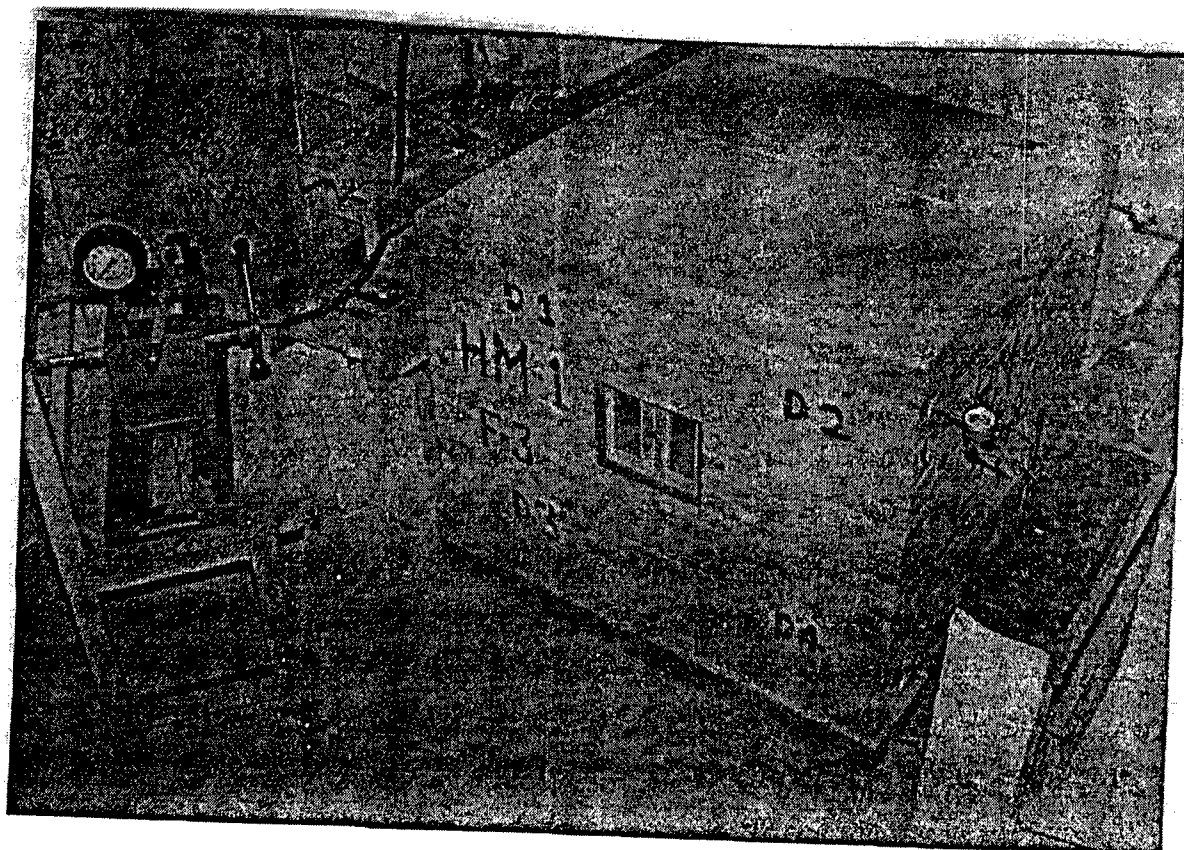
Test Setup for Building Model under Static Lateral Load
